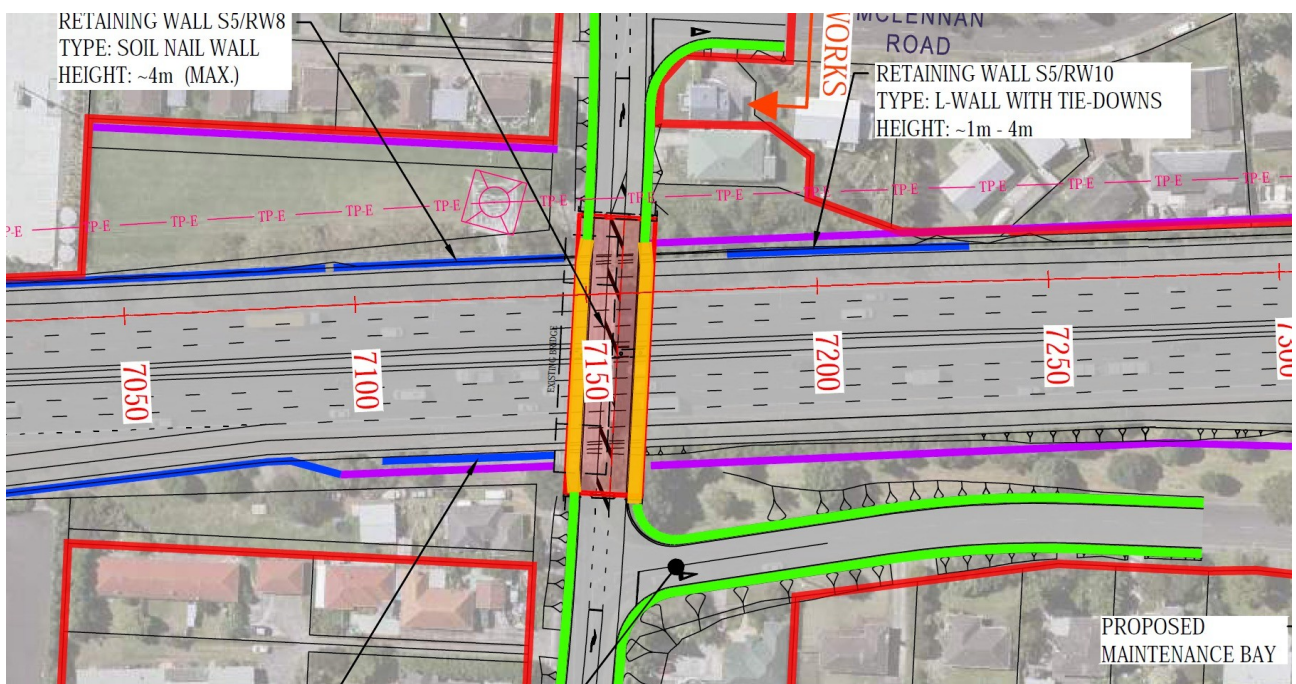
Showing the concept of the reconstructed Panama Road bridge with shared paths only (noting that the key calls out the green sections as footpaths - they are not cycle lanes)
